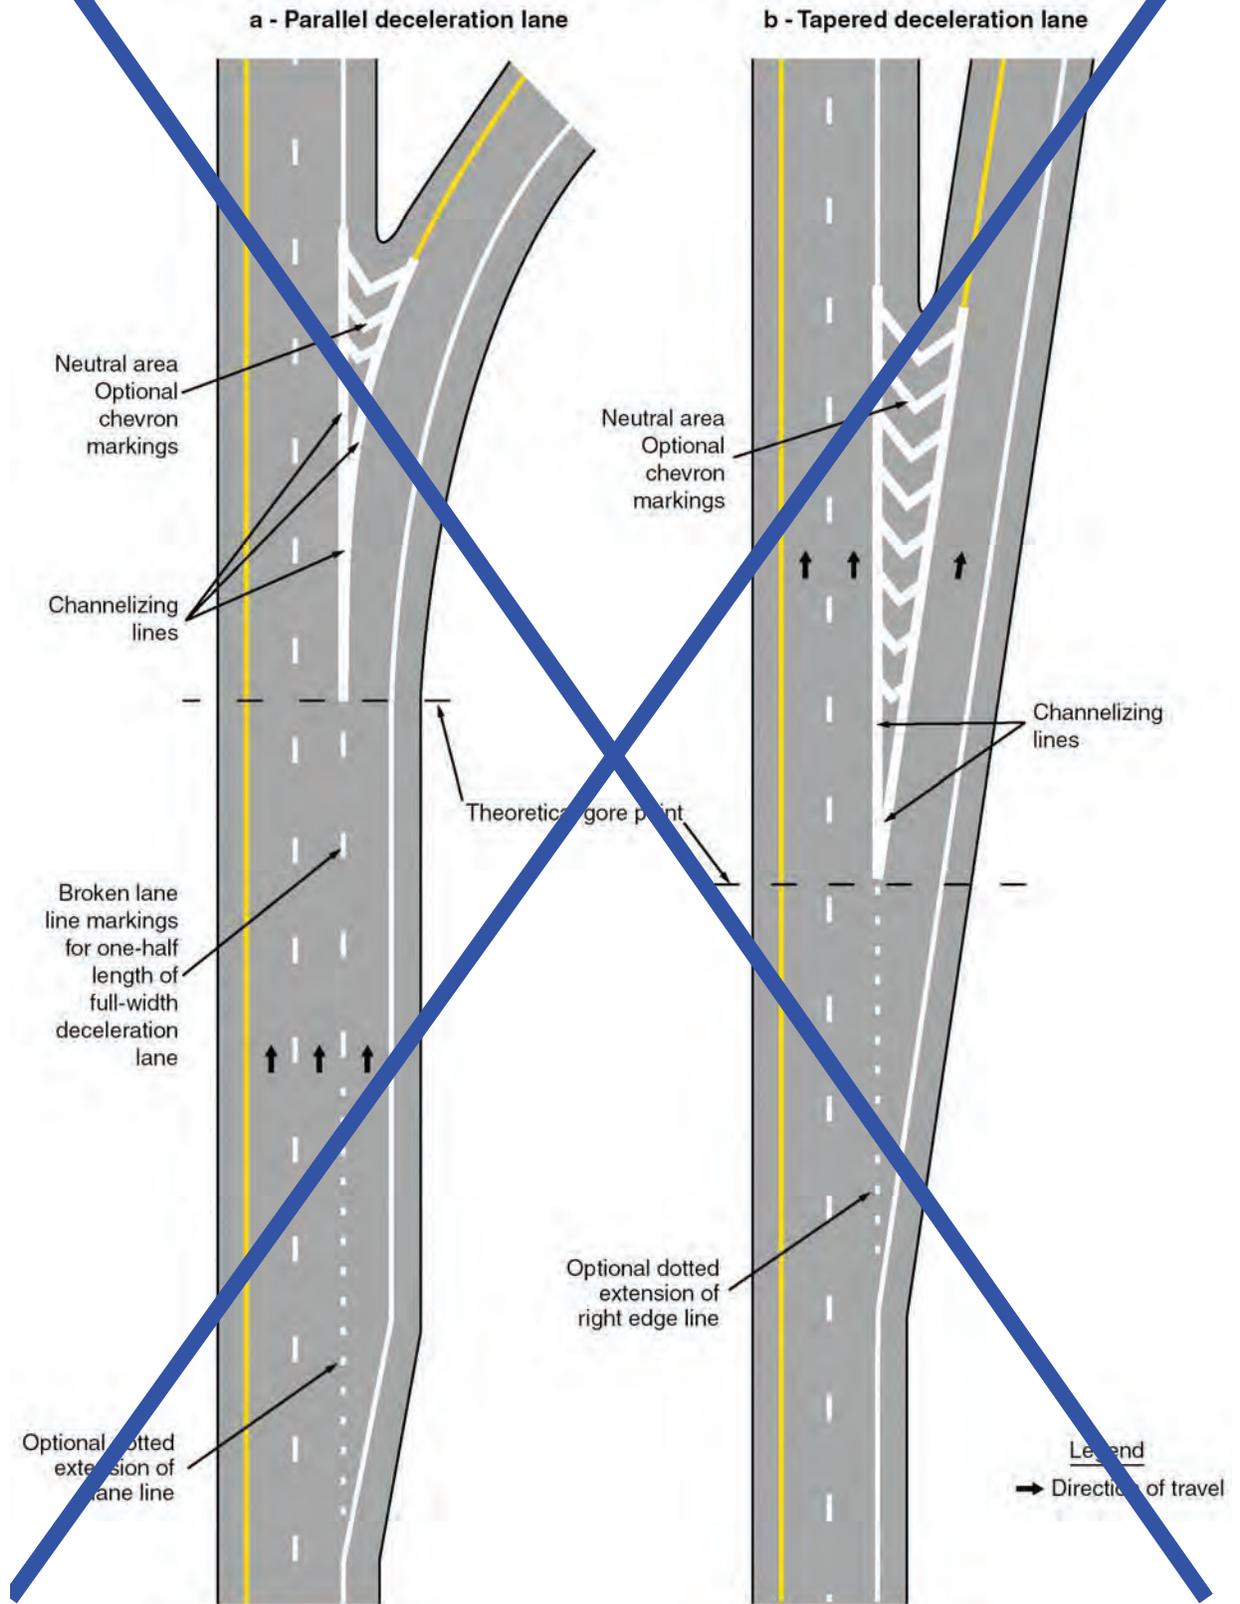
B-8. Examples of Channelizing Line Applications for Exit Ramp Markings (Sheet 2 of 2)
